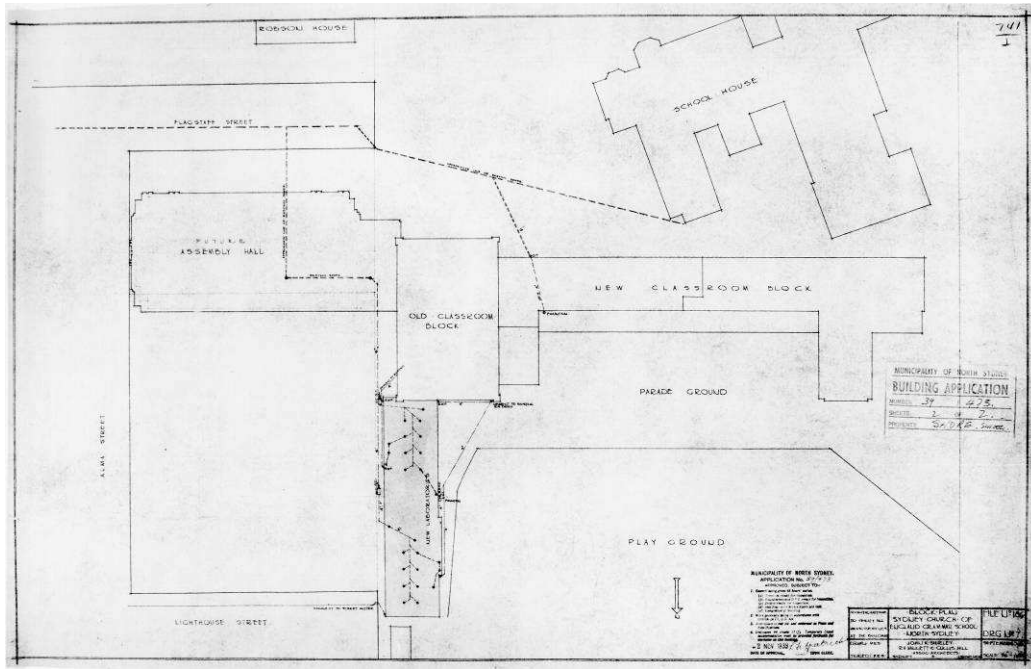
A site plan showing the 1938 Classroom Block (West Wing) and the 1940 Science Laboratory building (North Wing).
